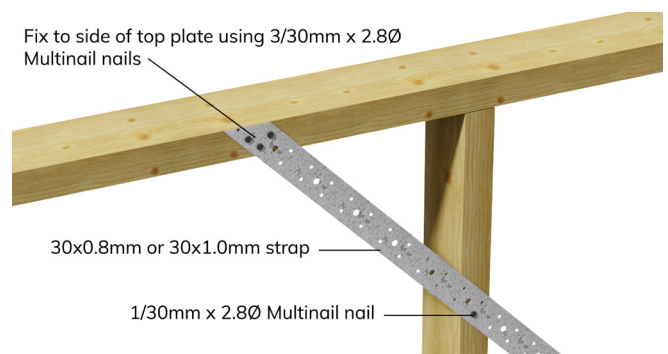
Nails to the side of the top plate - for 1.5kN/m bracing wall
